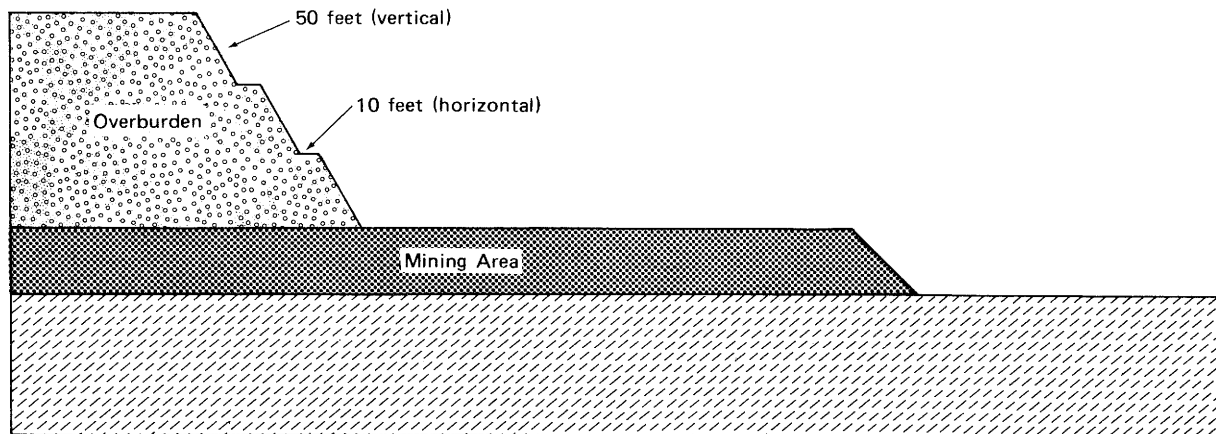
SCHEMATIC CROSS SECTION OF A SURFACE MINE
